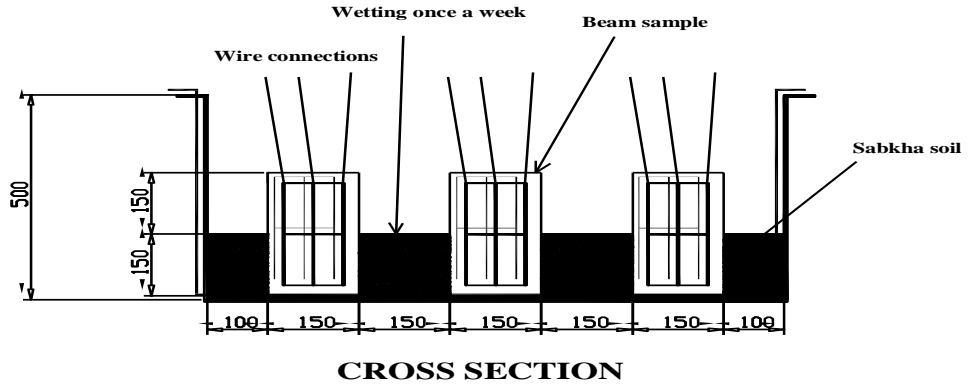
Schematic Diagram of the Concrete Beam Specimens for Exposure to the Below Ground Zone
